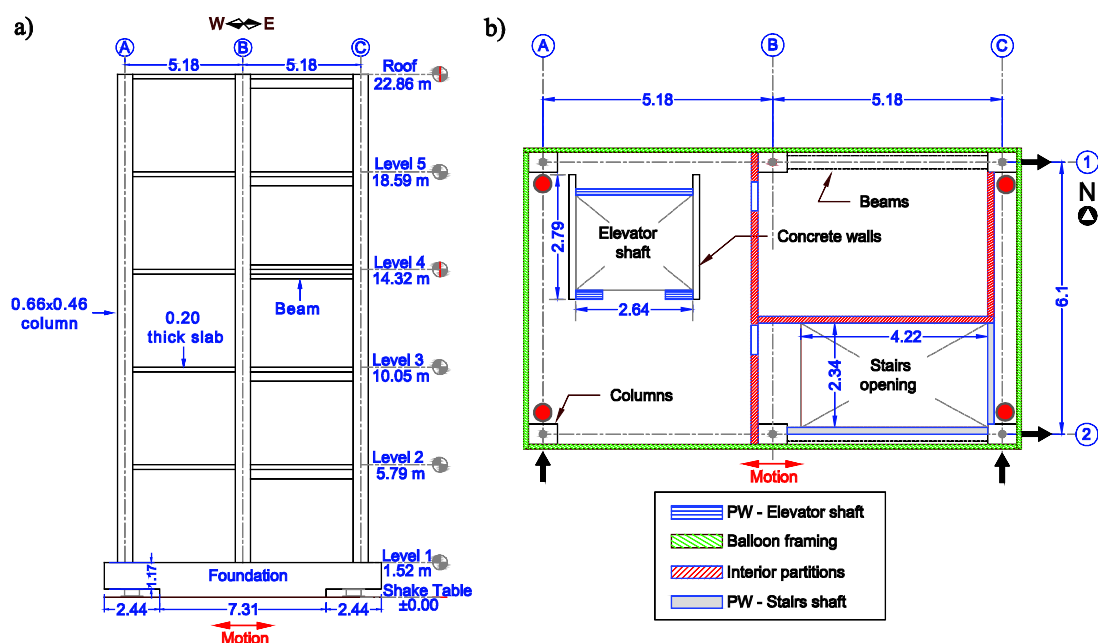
Test specimen: (a) South elevation, (b) Plan view of level 3 with temporary (black arrows) and final (red circles) accelerometer arrays (dimensions in m)
